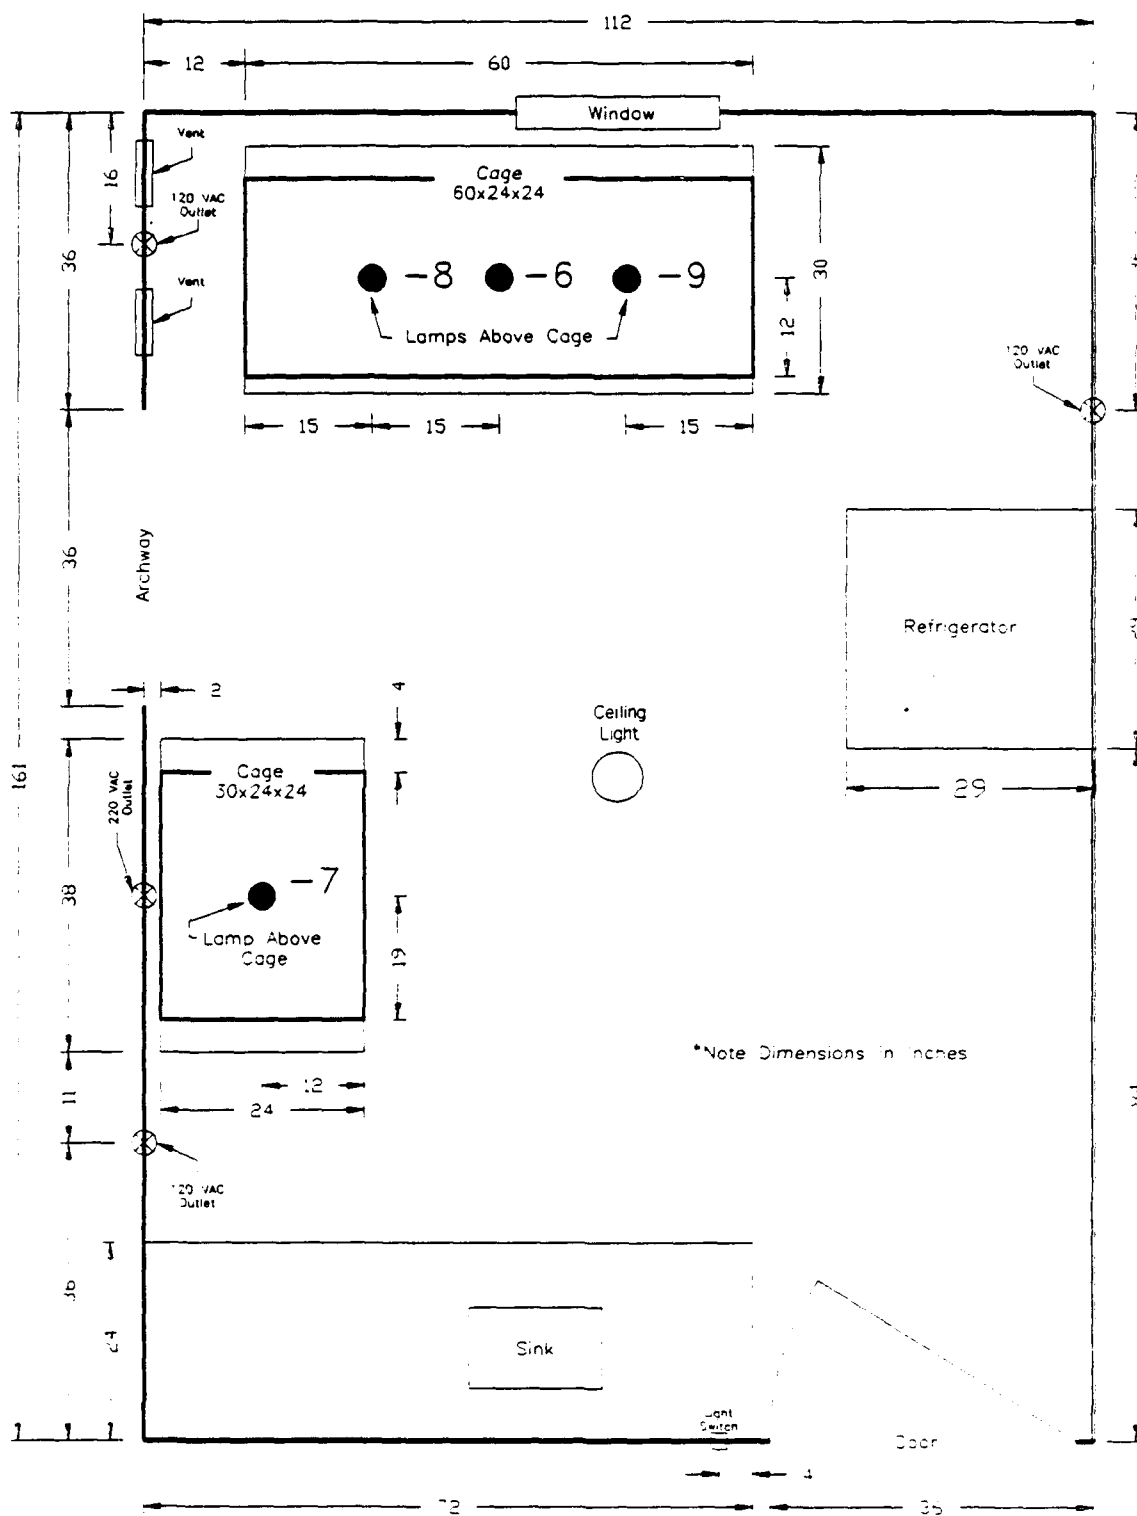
MEASUREMENT POINTS AT CRYSTAL FALLS LABORATORY, 2ND FLOOR WORK AREA; 2L1-6 THROUGH 9.
